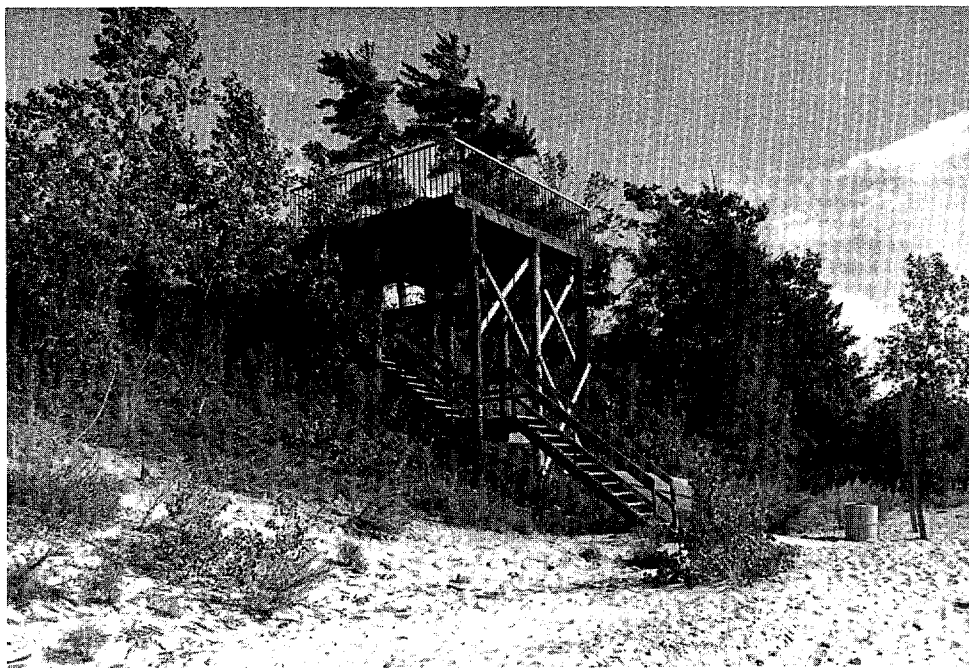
Dune Walkover and Beach Observation Structure at Brennan Beach.
